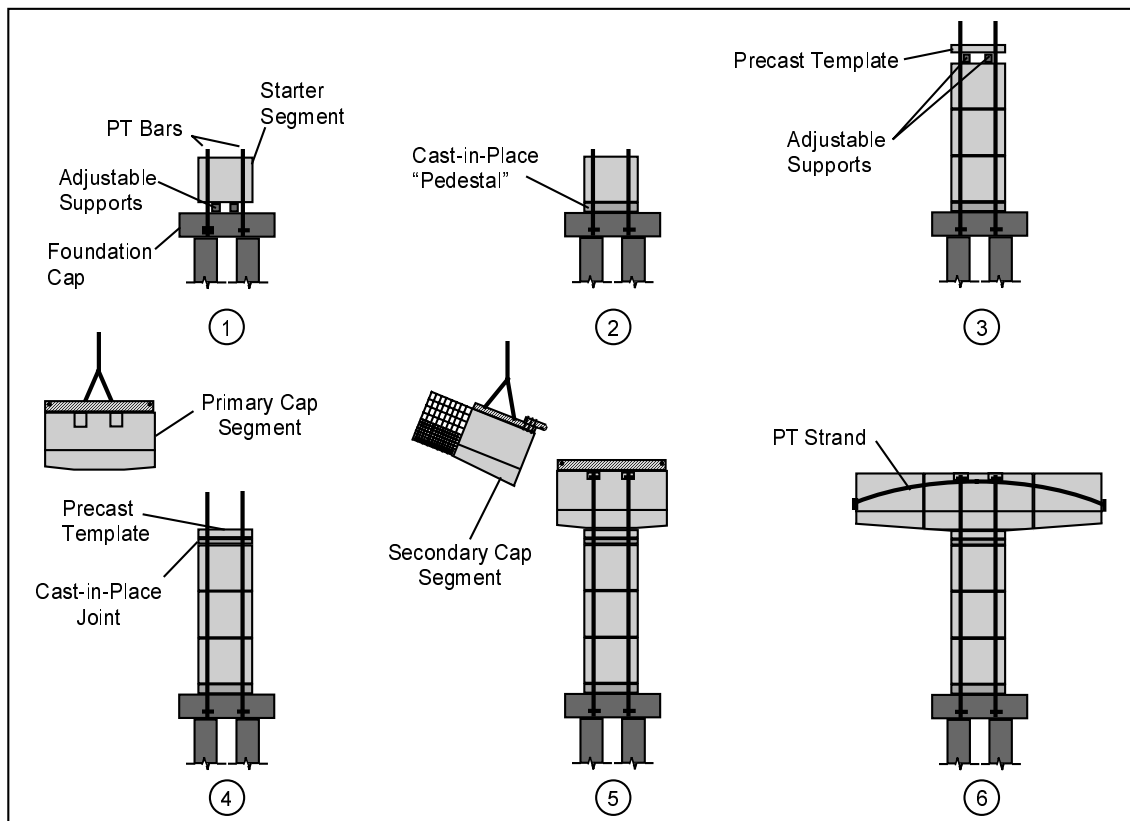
Erection sequence for the segmentally precast hammerhead pier of Proposal I
